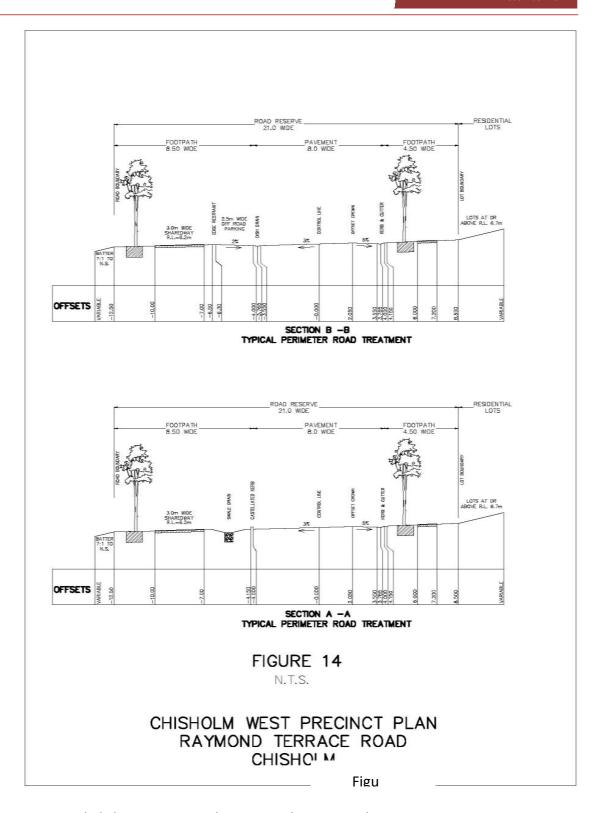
Chisholm West Precinct Plan - Raymond Terrace Road.
